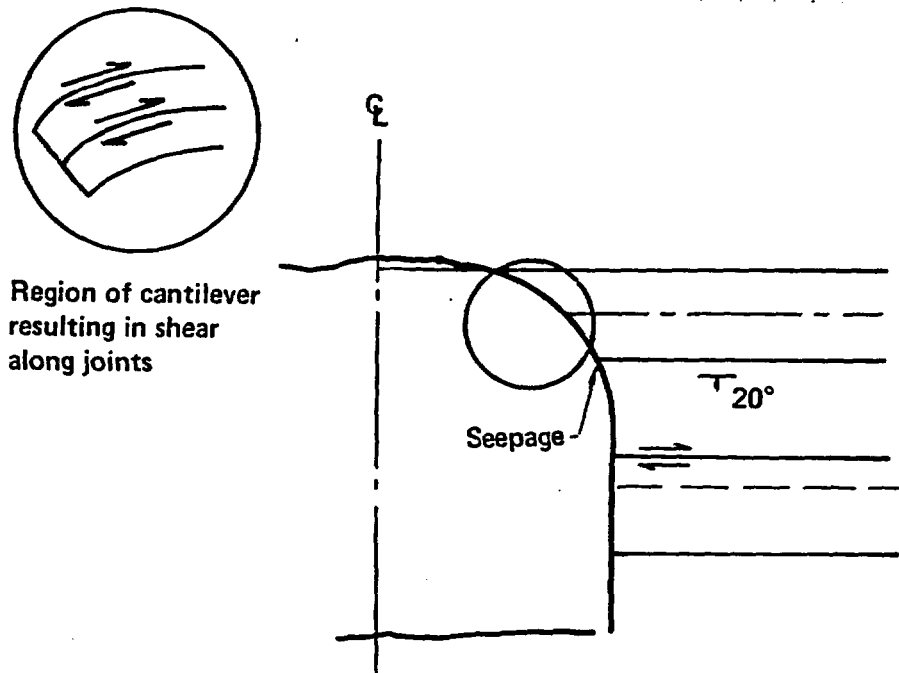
Cross-sections of the Pile Driver drifts showing intersections of low-angle joints, and deformations in relation to seepage.
